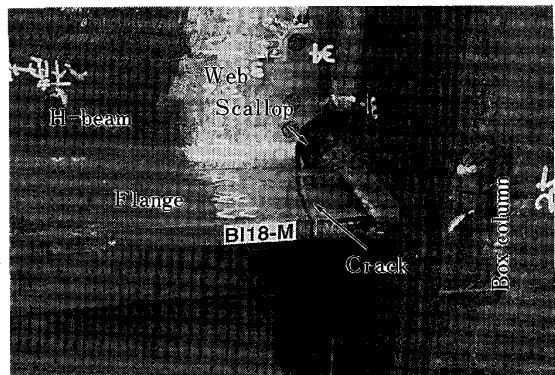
Brittle fracture at beam end of box column-to-beam connection.
